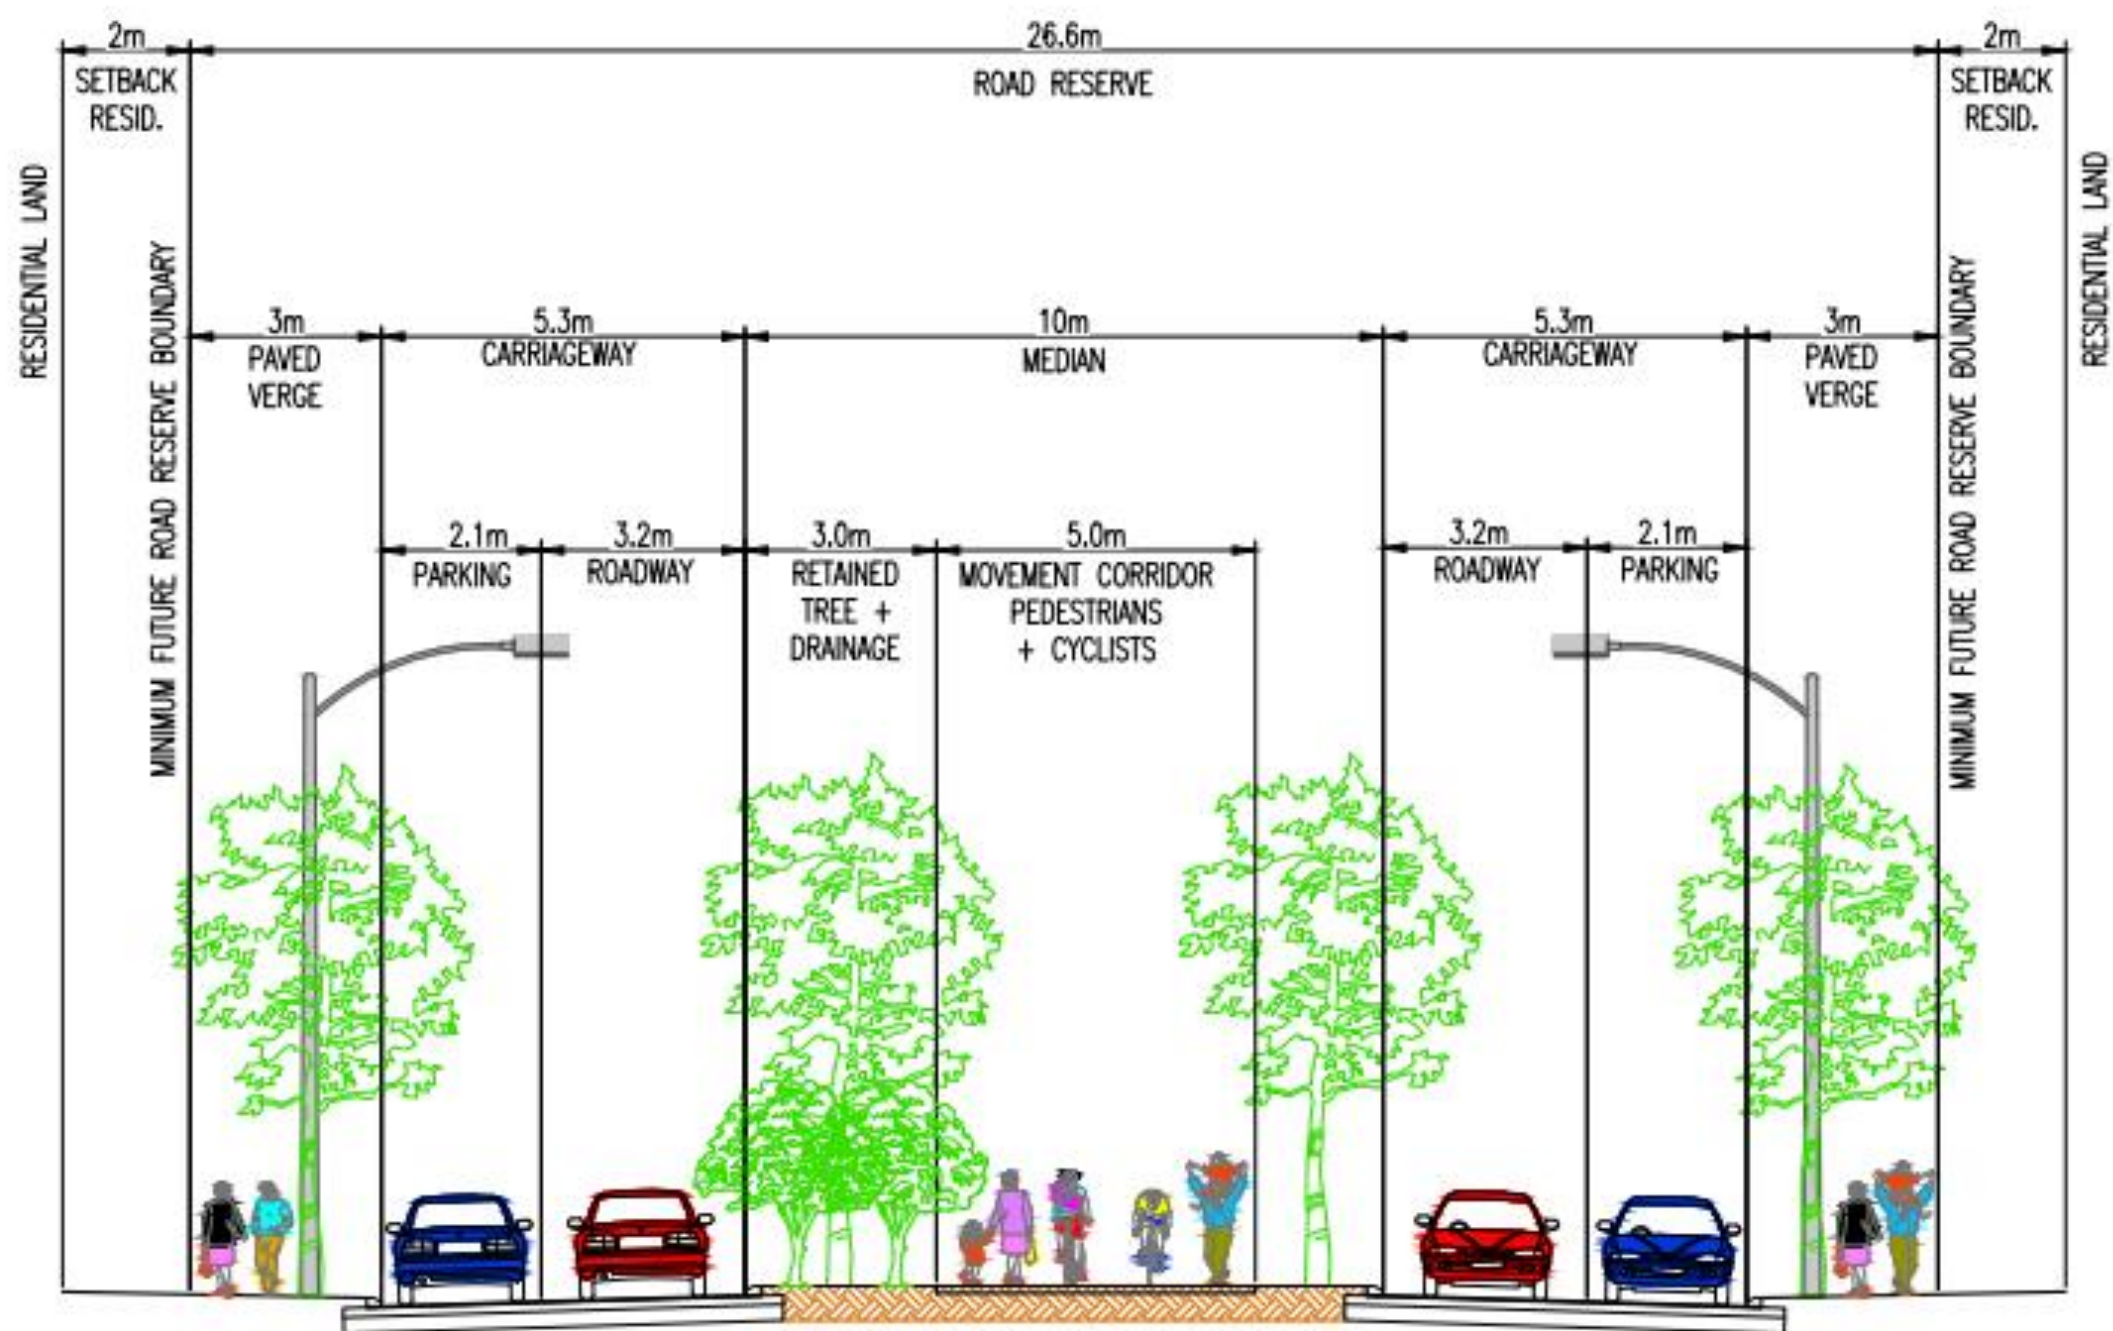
CROSS SECTION OF LANDSCAPE BOULEVARDS
